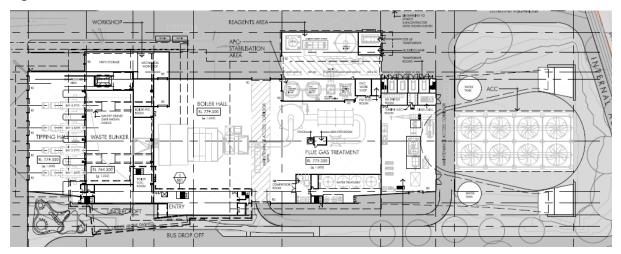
Woodlawn ARC General Arrangement of ARC Building³
